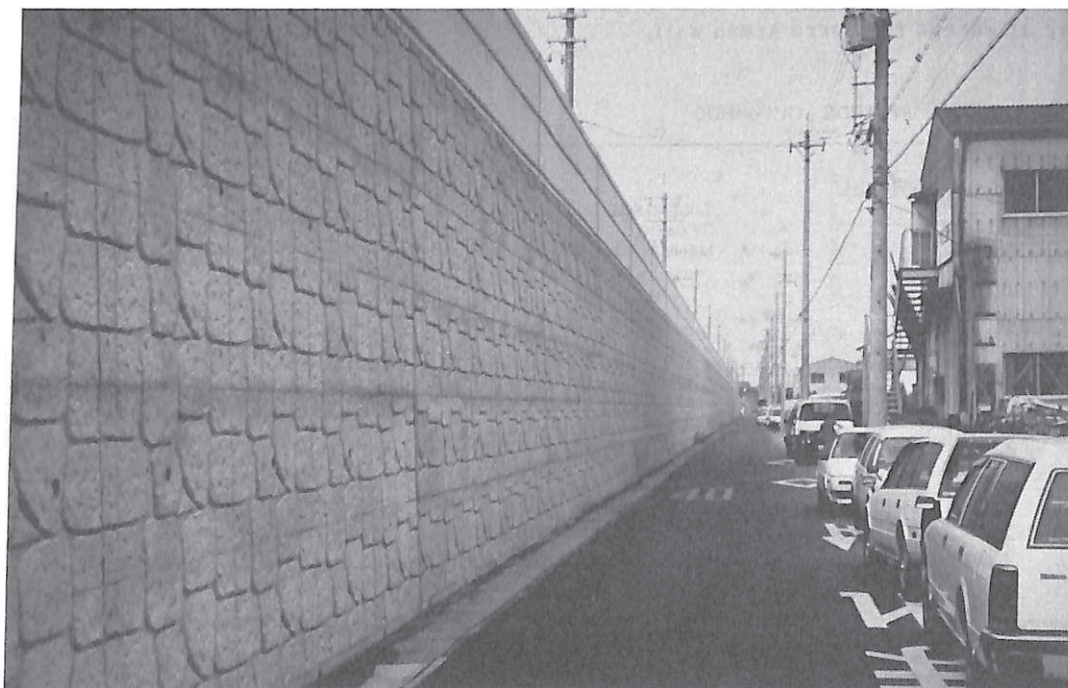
A view of the wall face of GRS retaining wall in Nagoya.
